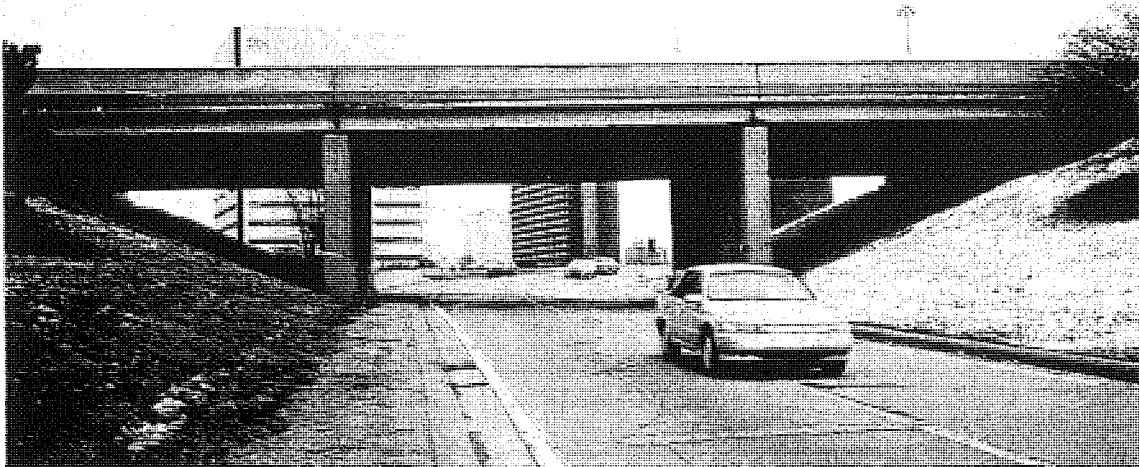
Bridge M39/M10, M-39 (Southfield Road) over M-10 Northbound (Lodge Freeway) in Southfield. View and Side Elevation.
